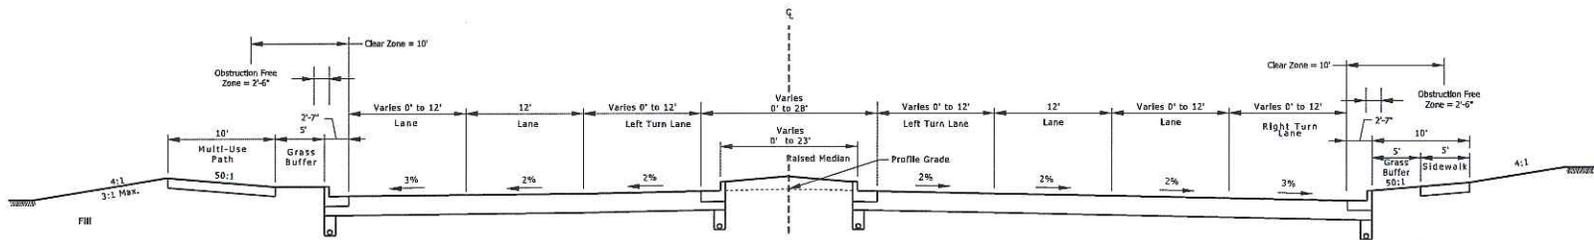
EXHIBIT E - DEPICTIONS OF TYPICAL CROSS SECTIONS
